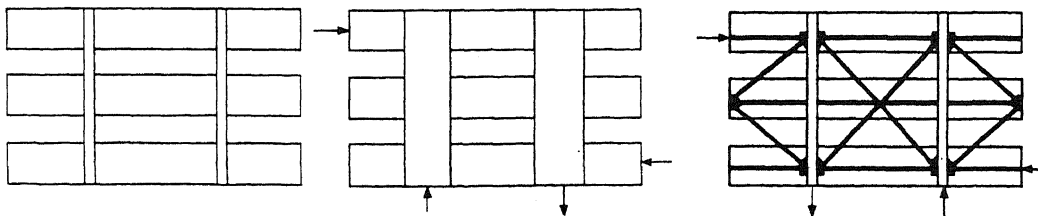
Unstrengthened frame Fig. 10b Column strengthening Fig. 10c Diagonal steel bracing
